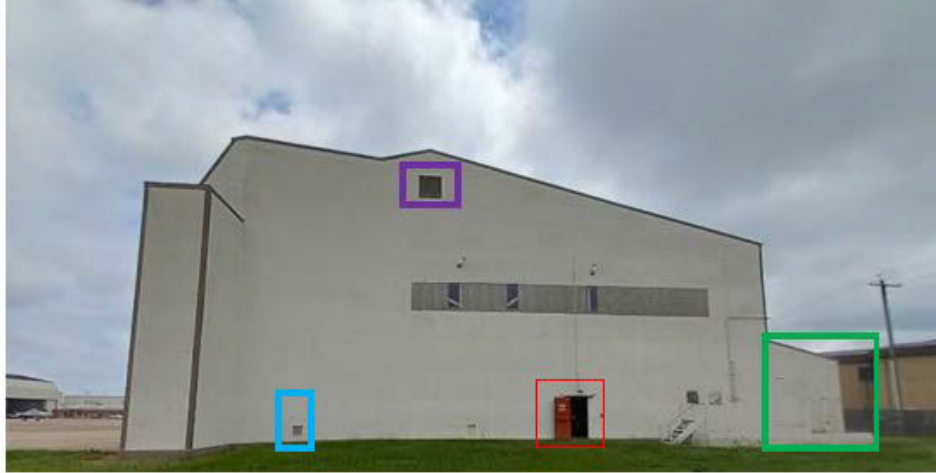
Image showing the current southwest (side) elevation. The door indicated in red would be replaced in-kind and the location indicated in blue would contain one new, identical door. The addition noted in green would be removed. A new addition would be recessed back on the elevation and primarily visible only from the rear elevation. One vent noted in purple would be removed.
